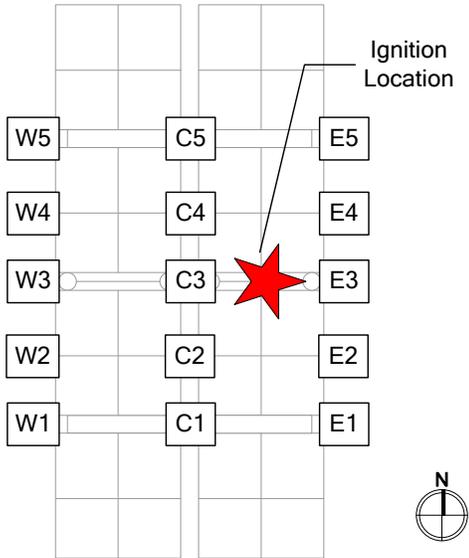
Plan view of air-flow measurement instrumentation layout
